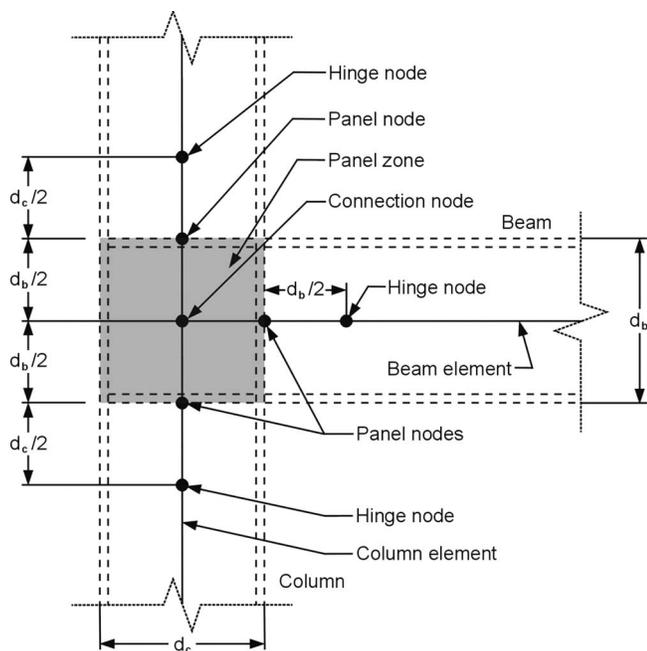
Typical frame-joint arrangement for moment-resisting connections
